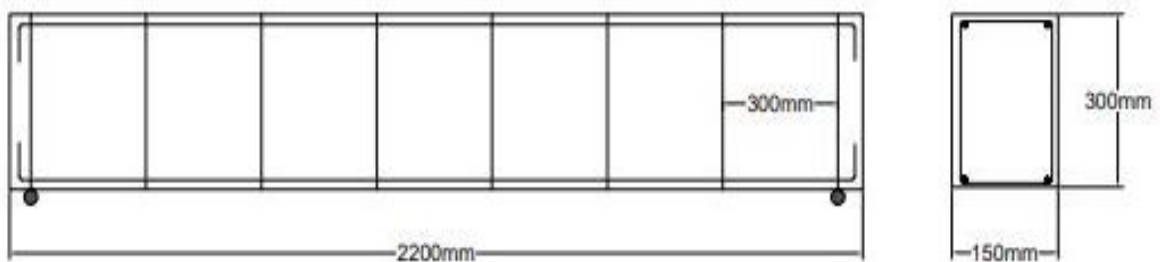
(a). Illustration of control solid beams (B1 and B7) without any opening and PVC pipe
